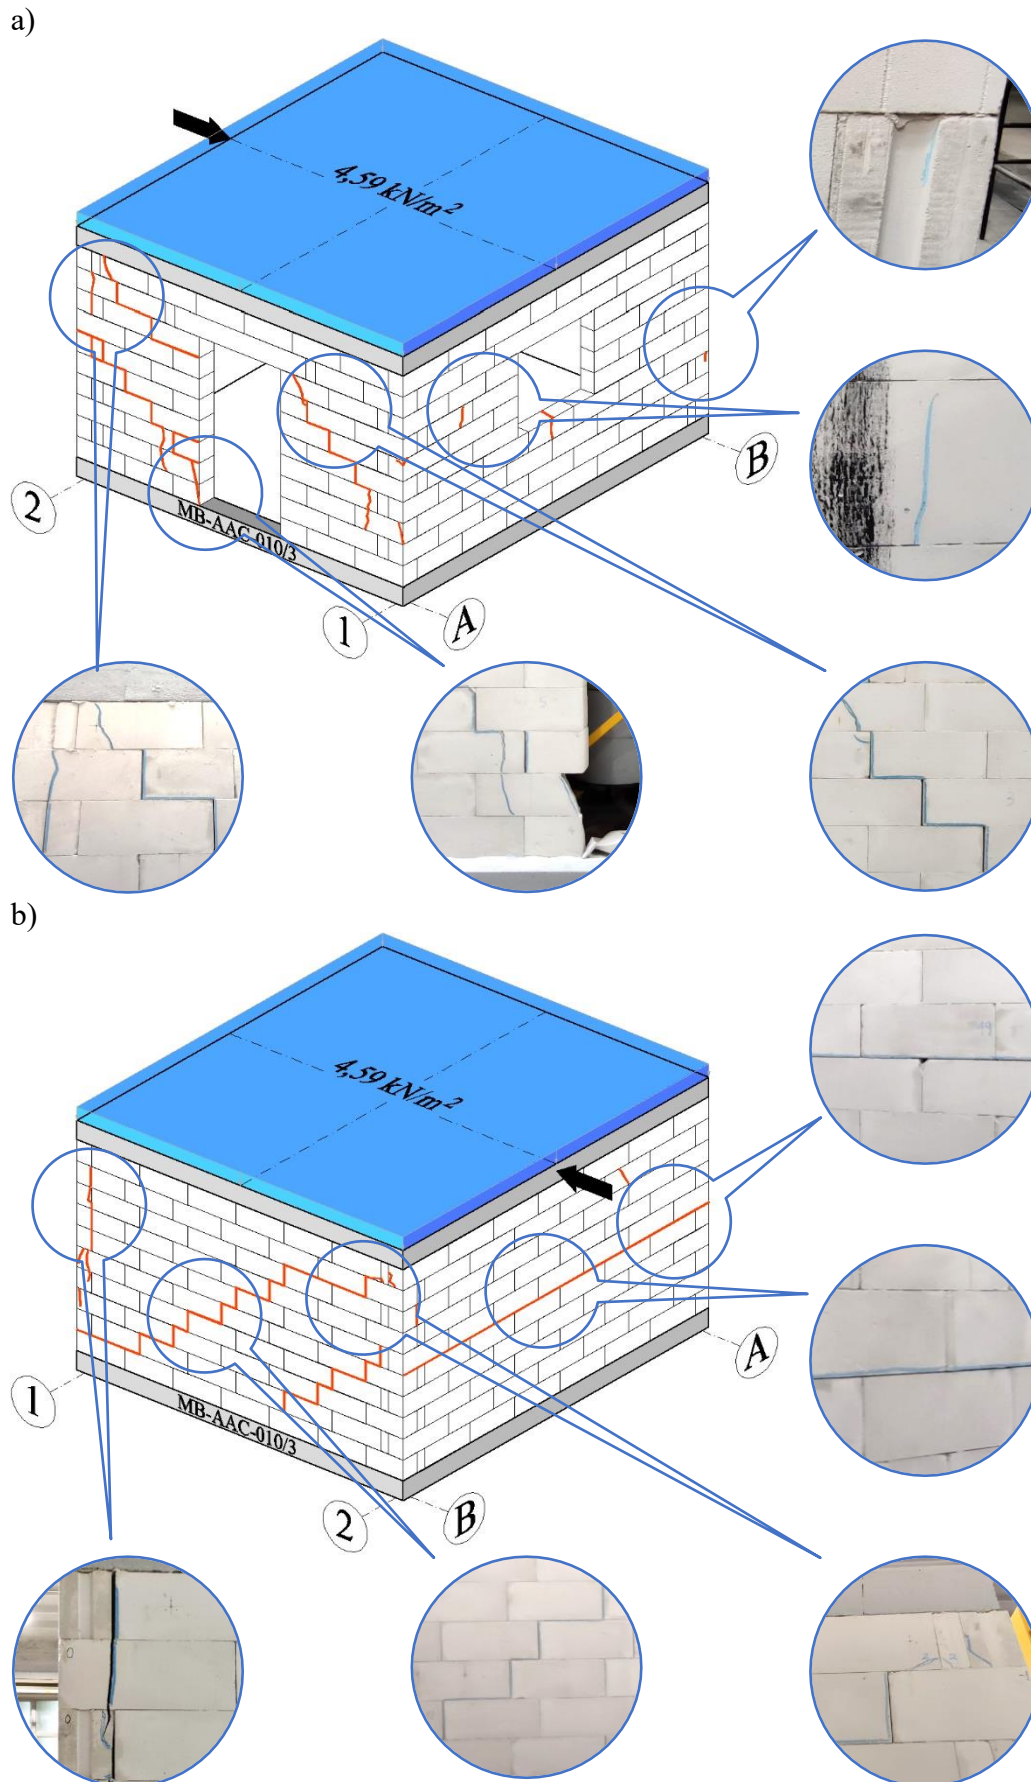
Crack pattern – model MB-AAC-010/3: a) view of the stiffening wall A with the door opening, b) view of the stiffening wall B without an opening
